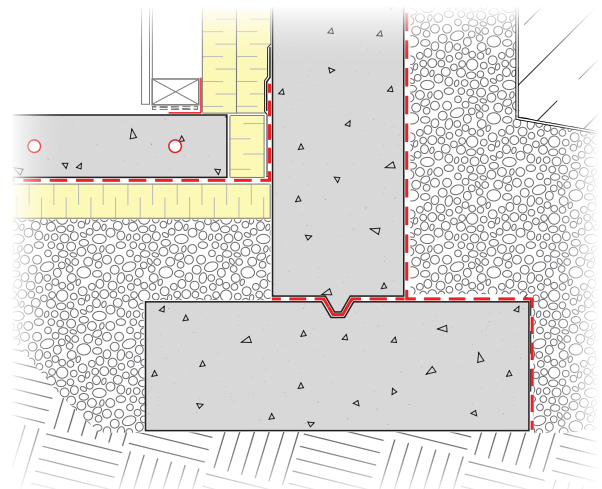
Insulation placement requirements for heated slabs where interior wall insulation is used.
